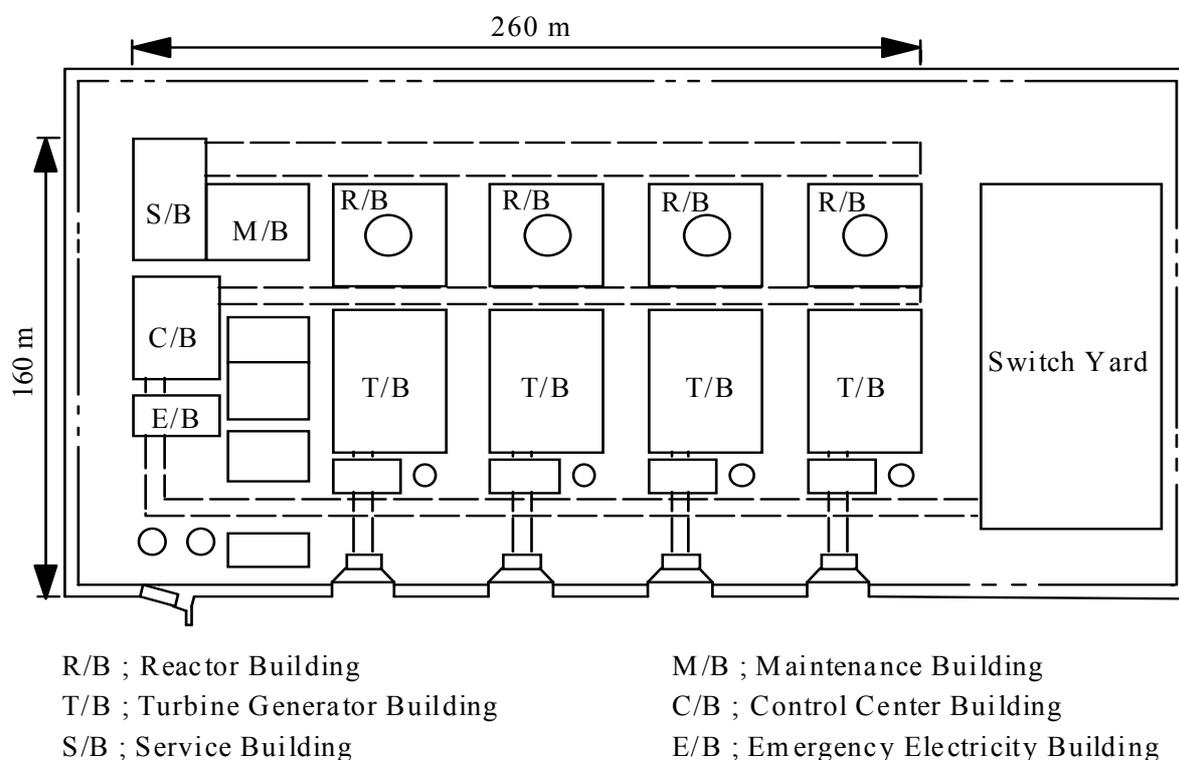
Layout of a 1300 MW(e) MDP based plant.
